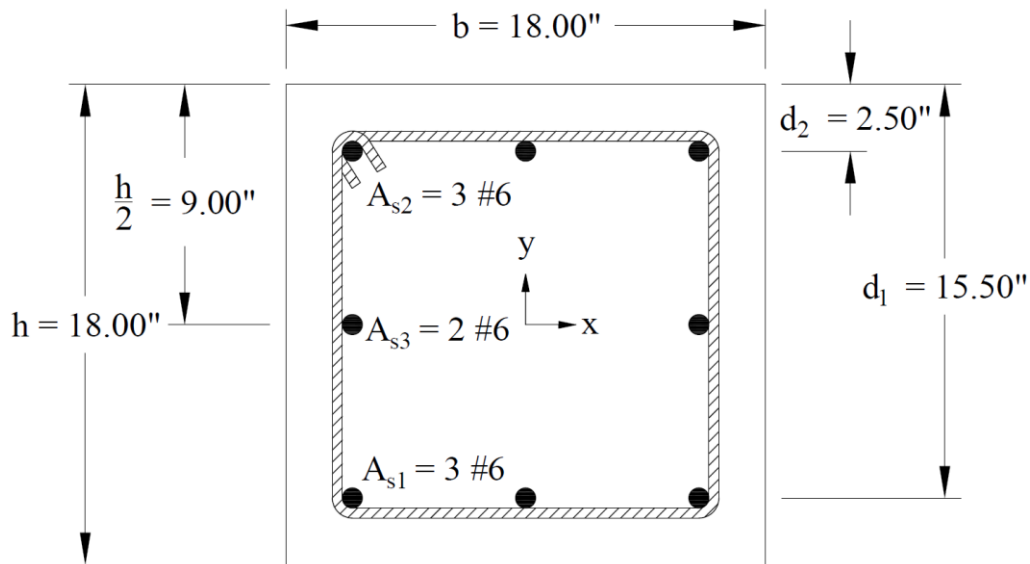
Slender Reinforced Concrete Column Cross-Section
